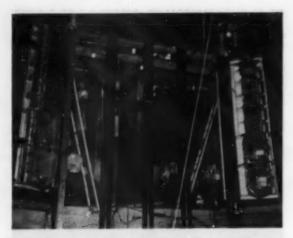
Excellent construction view shows two of the four tangential burner assemblies with coal feed at top and blast furnace gas supply through side boxes
